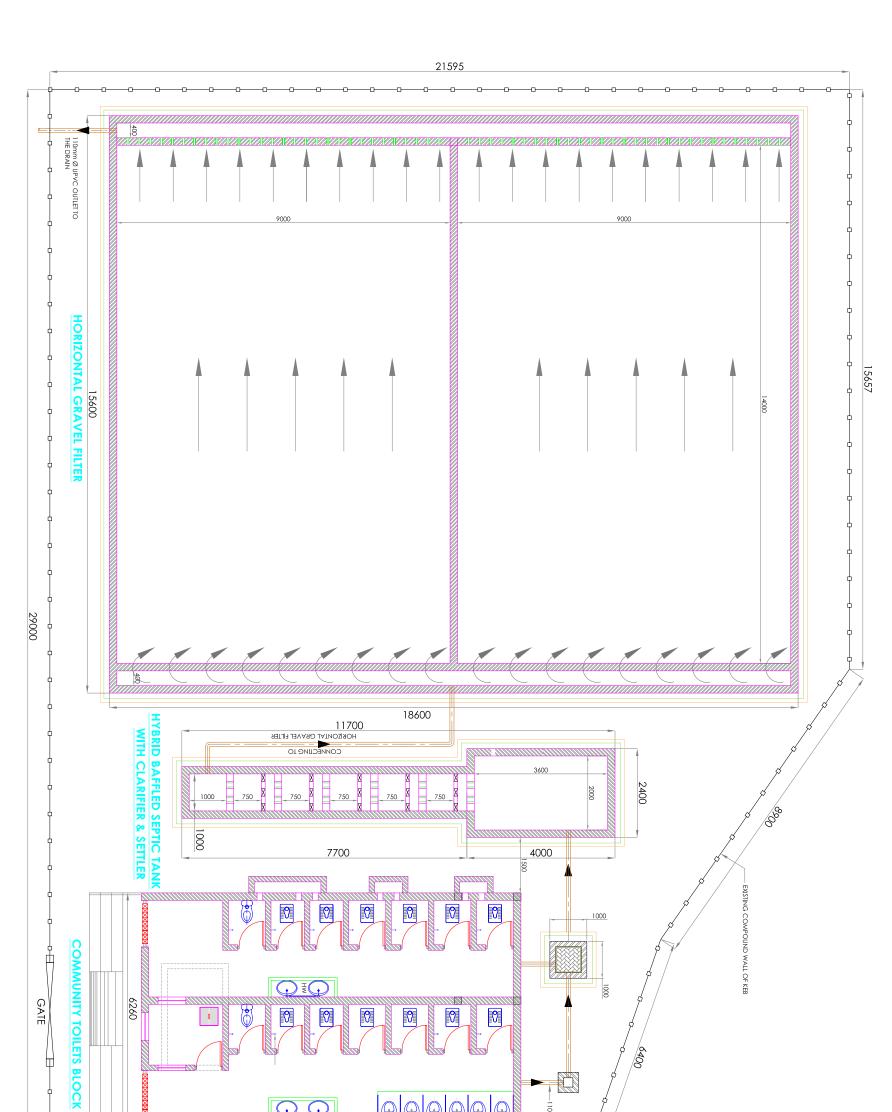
LAYOUT PLAN OF THE DEWATS AT GOVERNMENT PRIMARY SCHOOL
